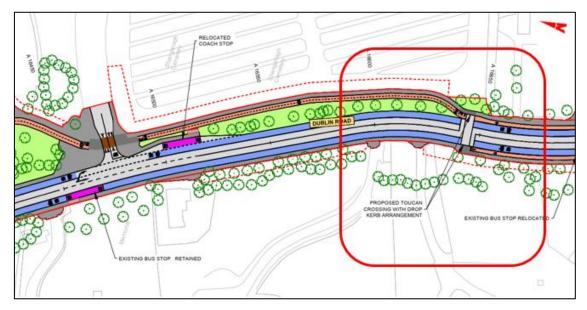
Extract from General Arrangement Drawings showing Proposed Toucan Crossing at Chainage 16+500 (Sheet 47)
